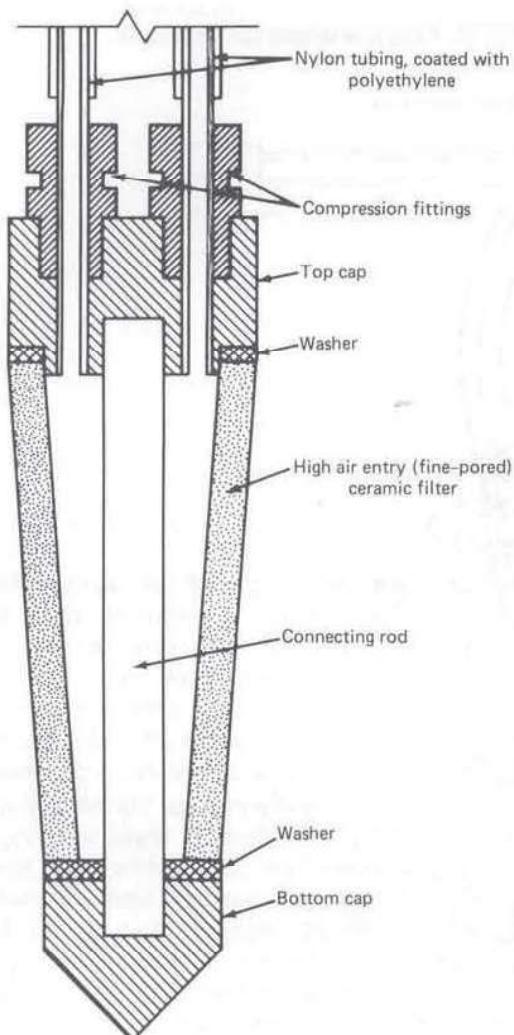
Bishop twin-tube hydraulic piezometer (after Penman, 1960).
